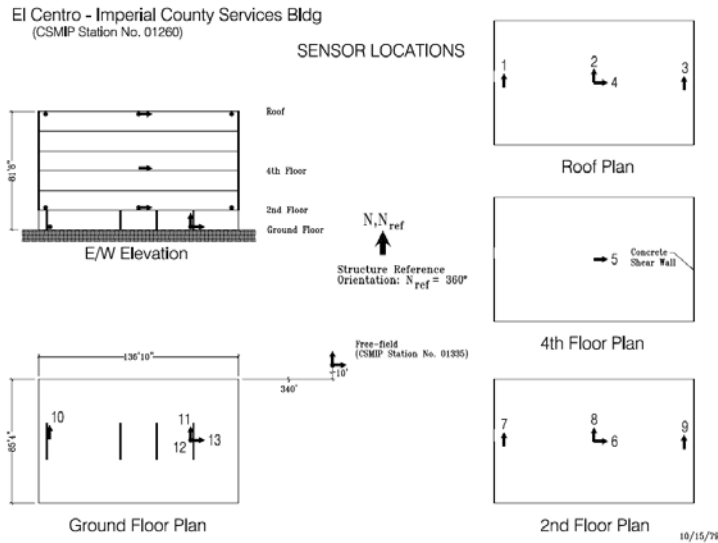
Layout of the sensors installed at ICS building (taken from CSMIP web site).
